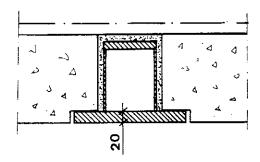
a. Steel floor girder carrying precast concrete floor units on the bottom flange
